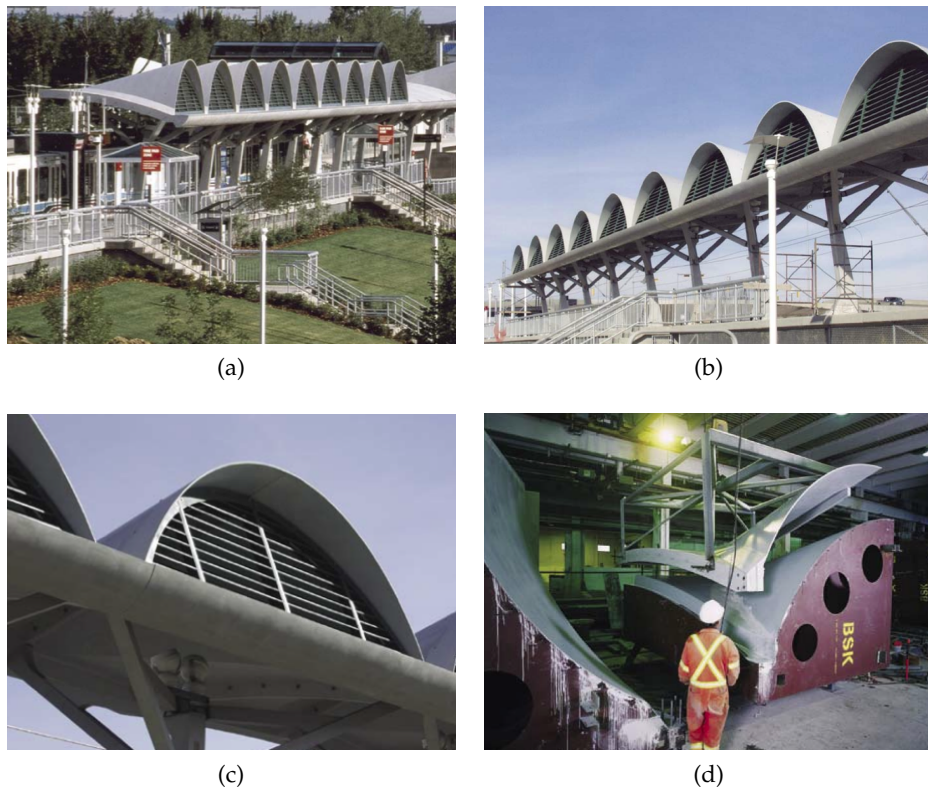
Shawnessy Light Rail Transit Station [5], UHPFRC used for shell roof slabs, cast in injection moulds
